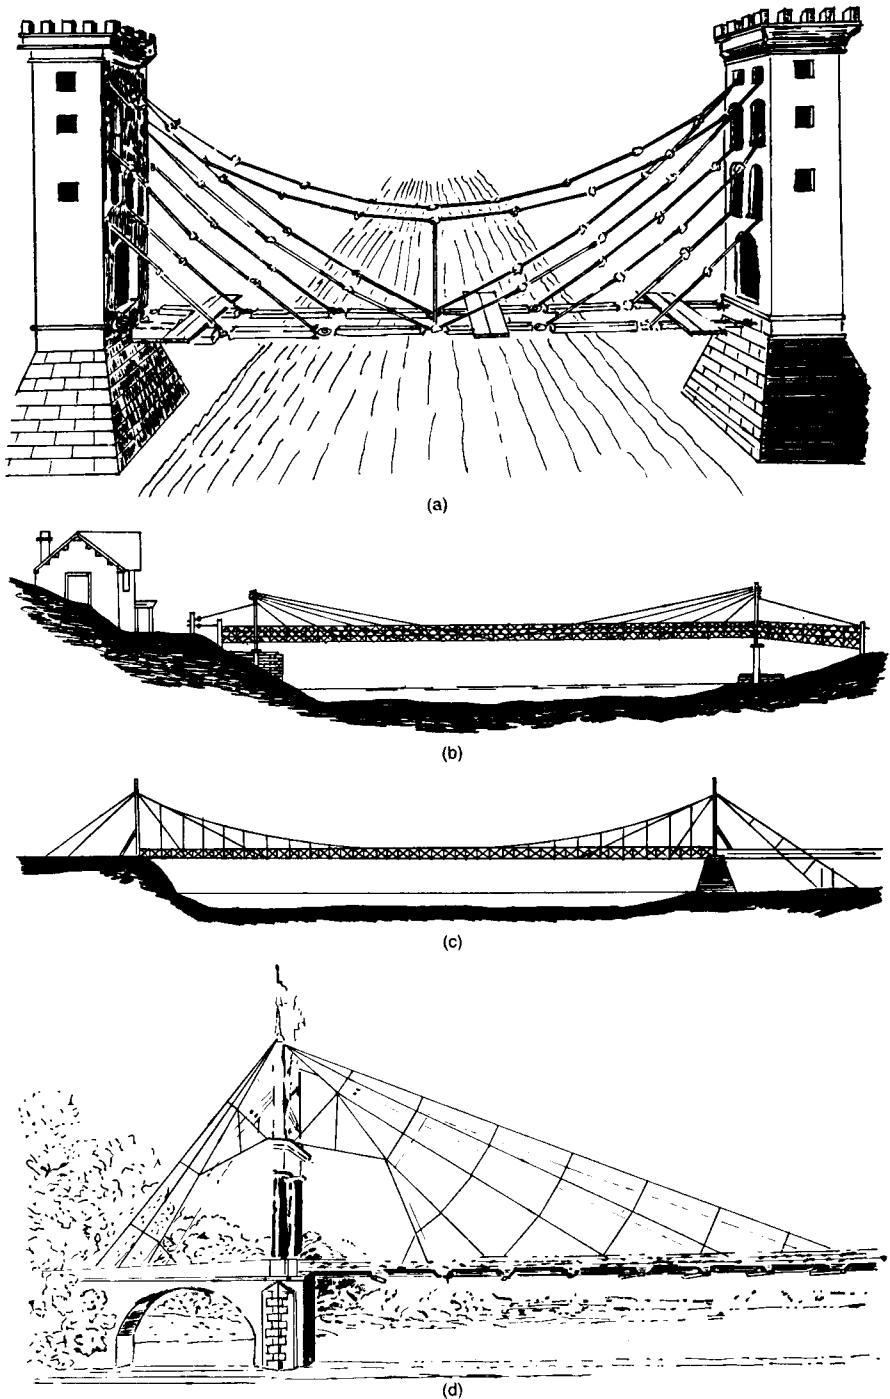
(a) Chain bridge by Faustus Verantius, 1607. (b) King's Meadow Footbridge. (c) Dryburgh-Abbey Bridge. (d) Nienburg Bridge. (Reprinted with permission from K. Roik et al. "Schrägseilbrücken," Wilhelm Ernst & Sohn, Berlin.)
